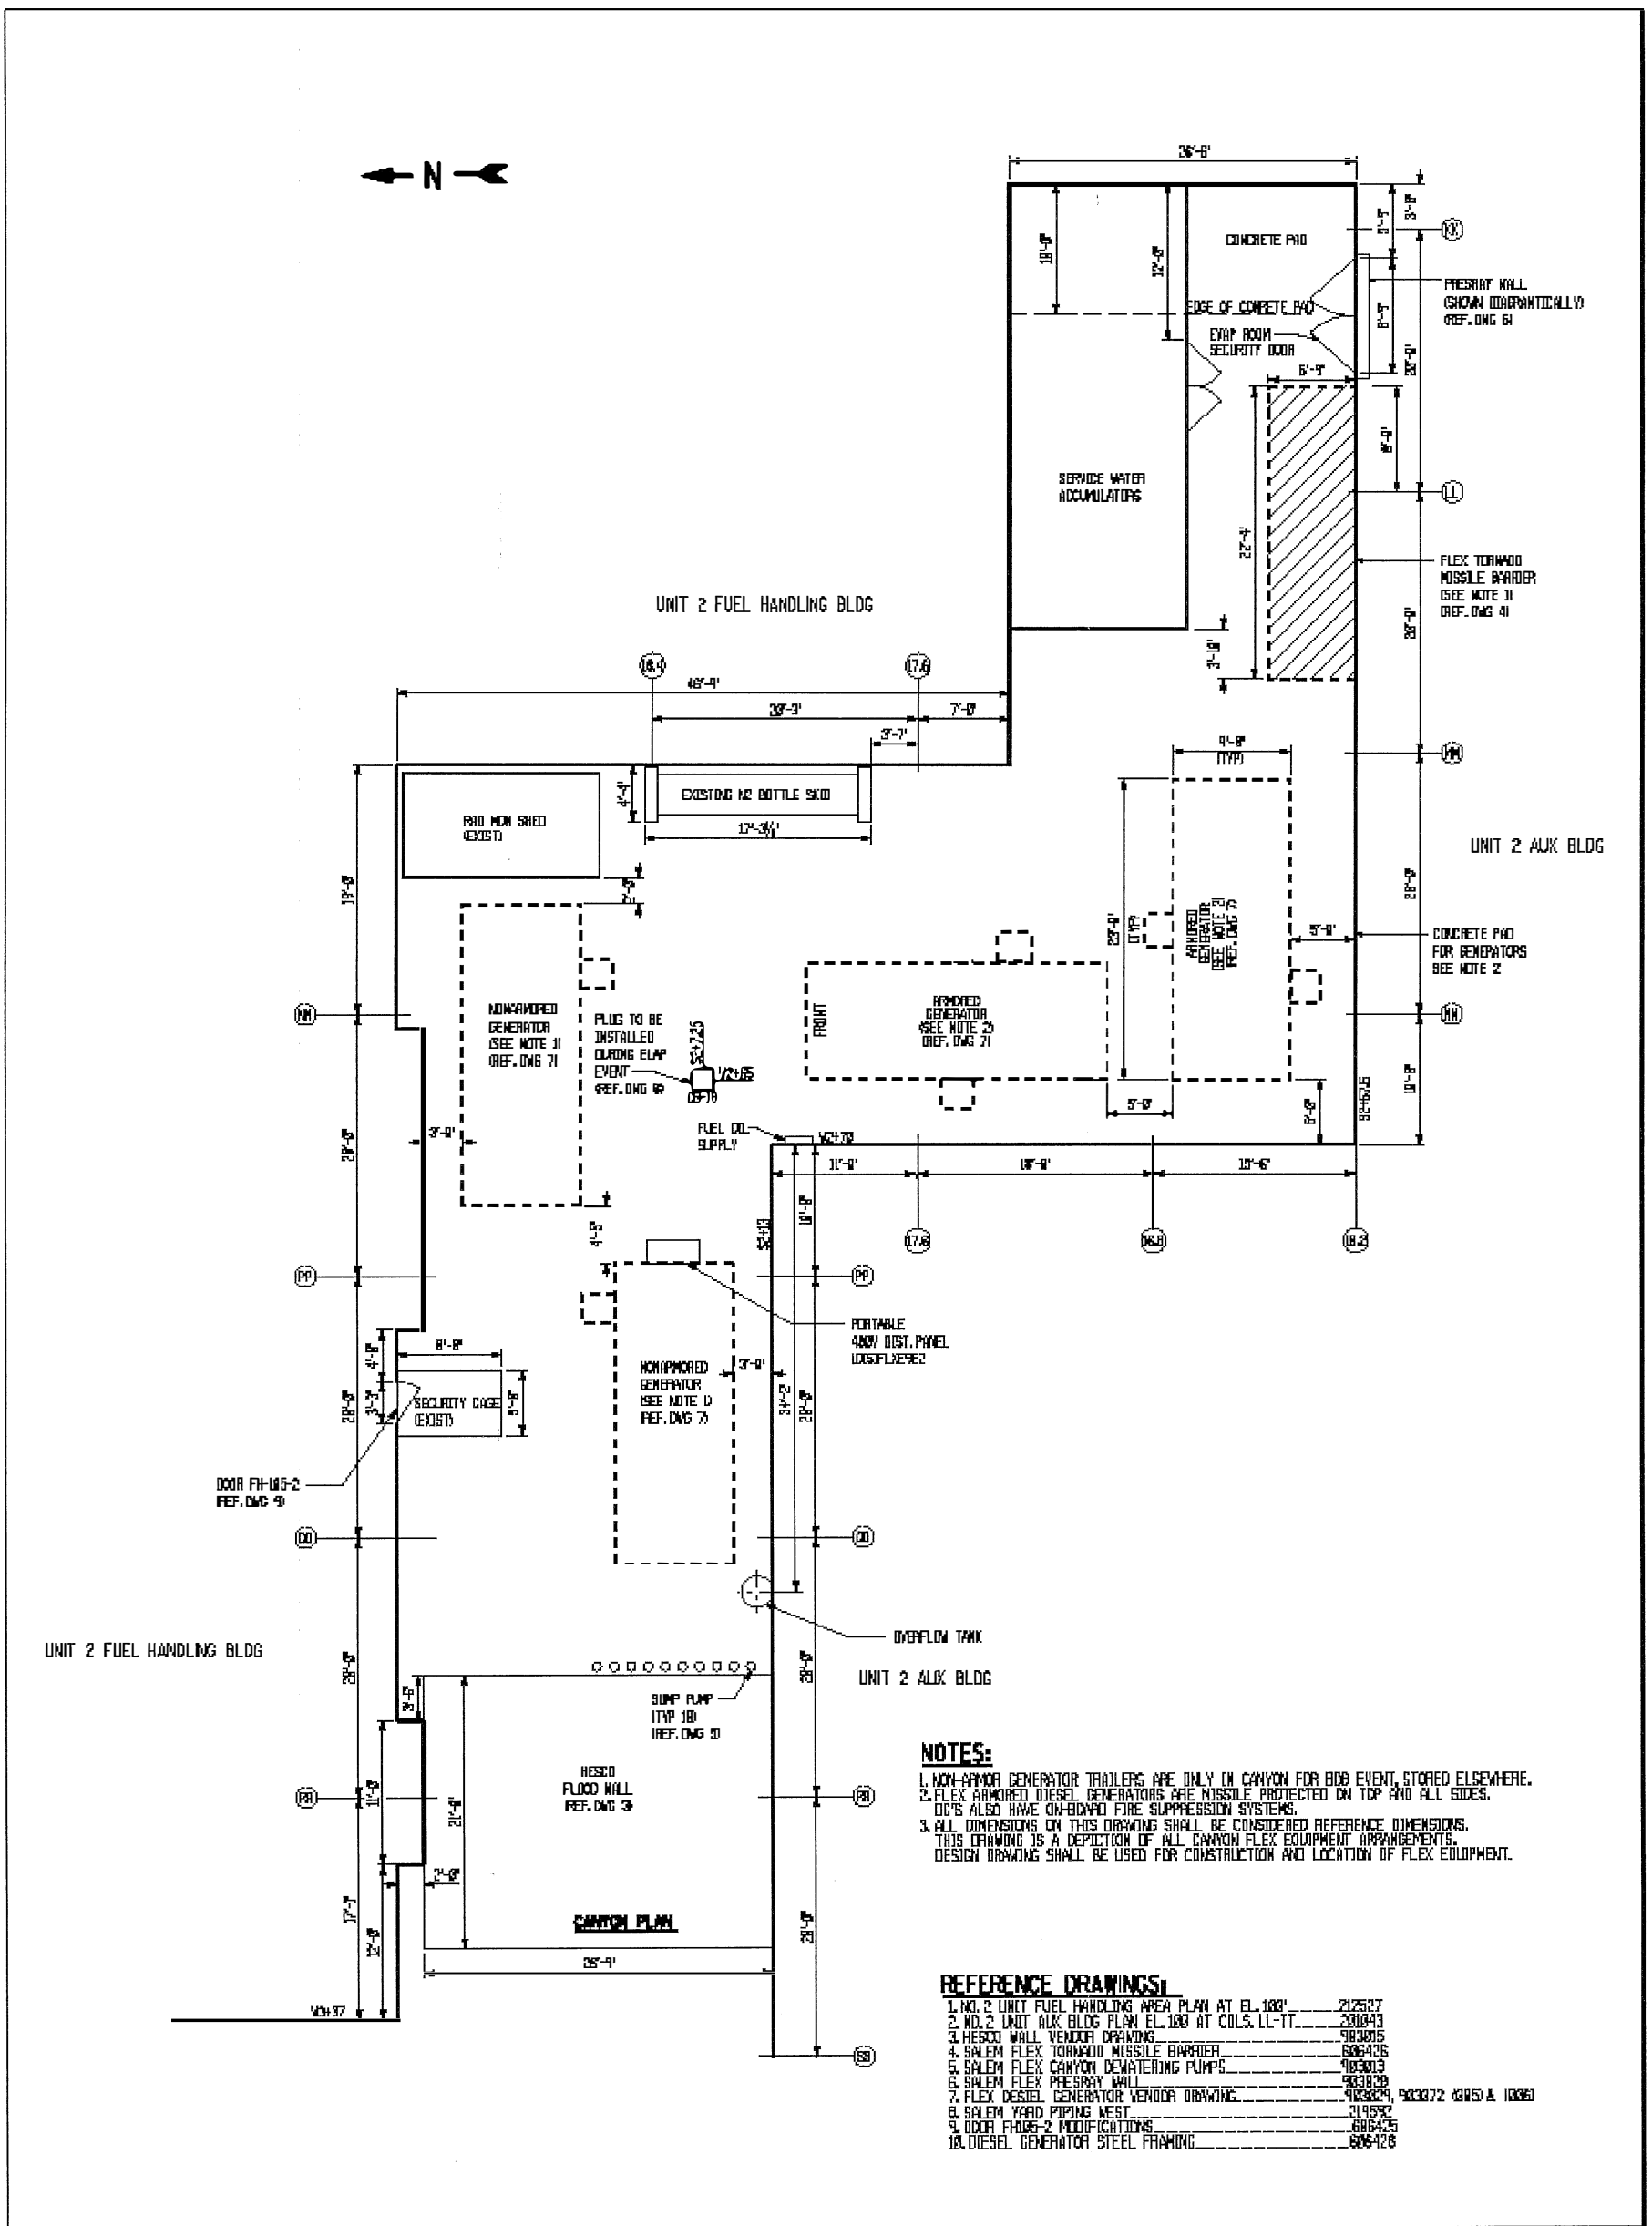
FLEX Canyon Layout (PSEG Drawing 606424, sh.1)
